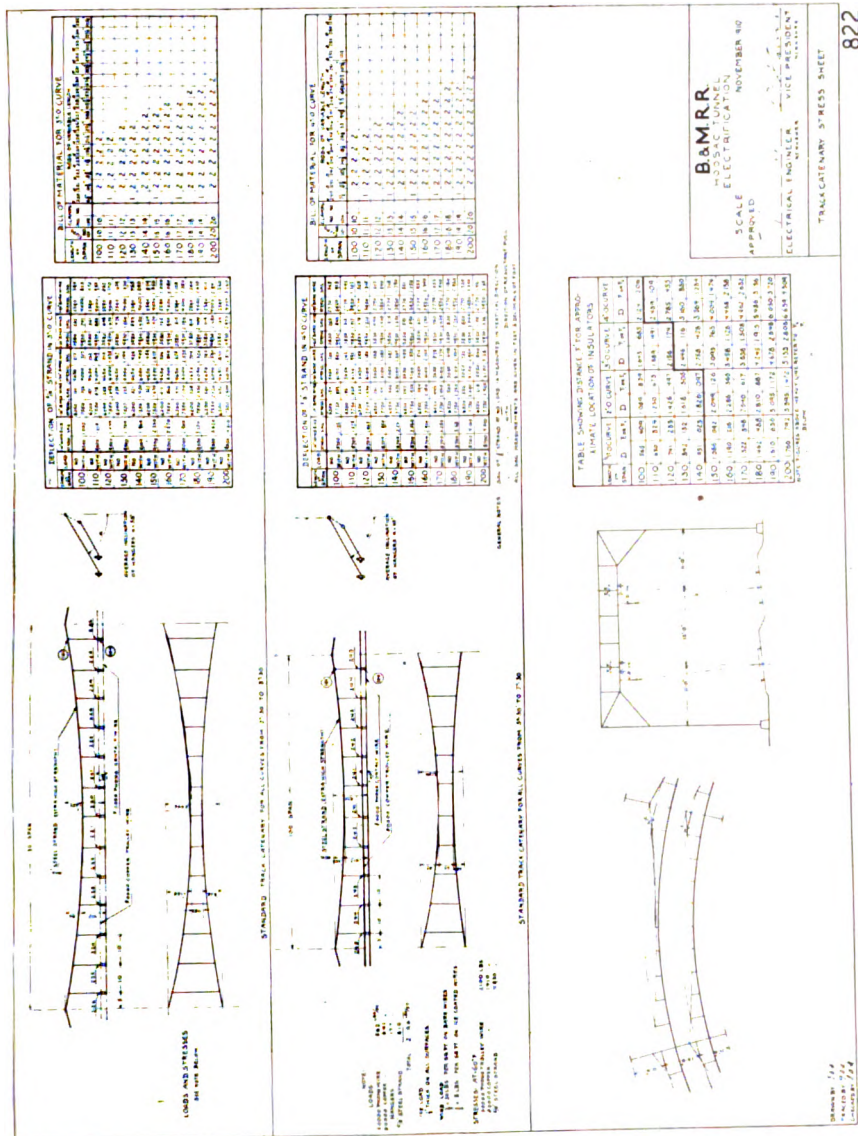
Hoosac Tunnel track catenary stress sheet
